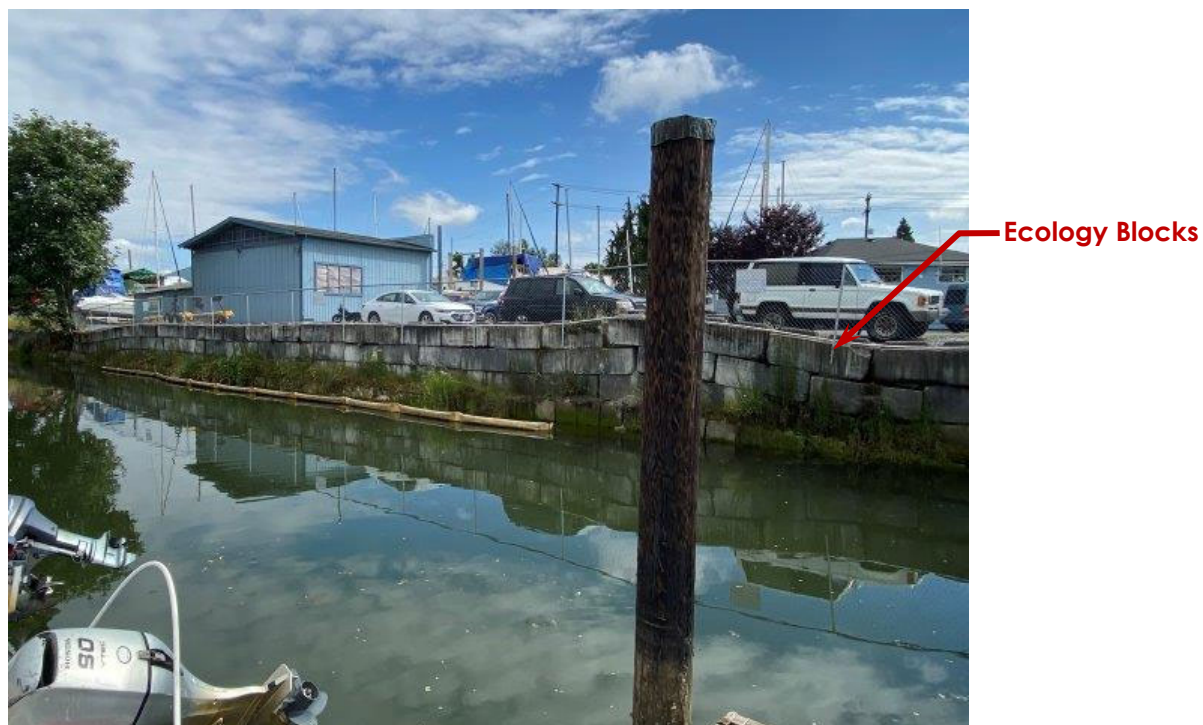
Retaining Wall Bulkhead (Looking South West)
